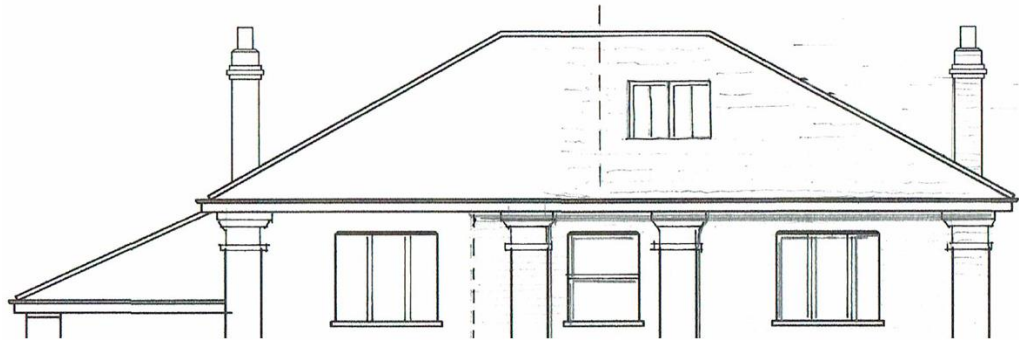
conservation roof lights approved at the appeal property in 2018 and retained as part of the current application at appeal.
